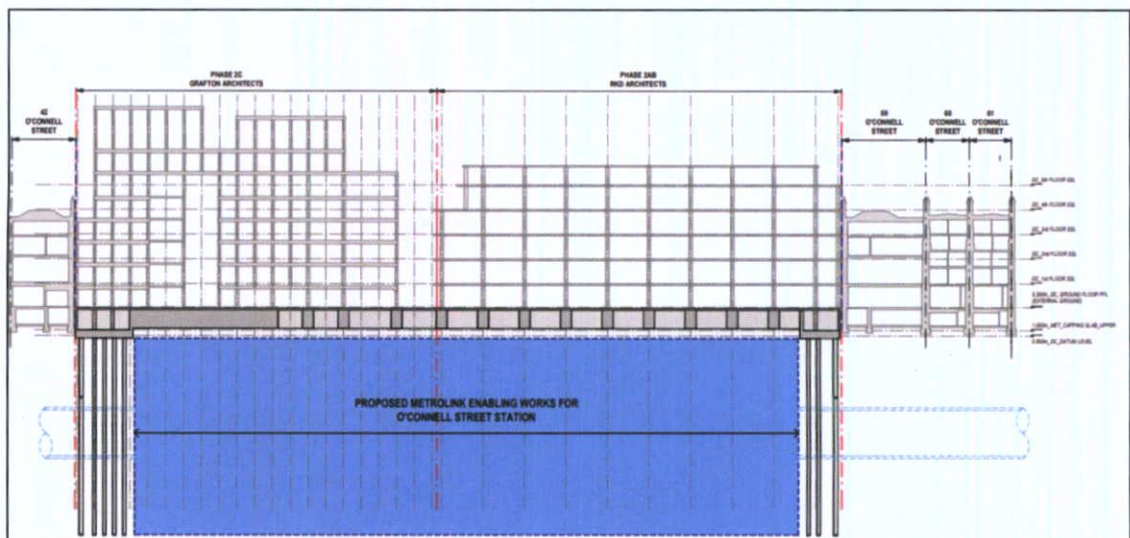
Cross section profile (north-south) showing the MEW beneath Site 2 (2AB and 2C)
